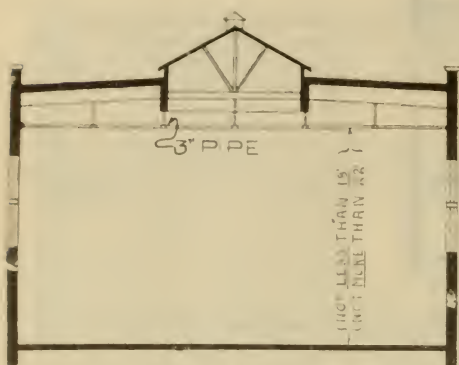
Low Girders: A Condition Common to Many Basement Gymnasias. The above situation is the opposite of that shown in Fig. 10. The apparatus beam plan here shown would be necessary, also in a room having flat concrete or false ceiling without projecting girders.
